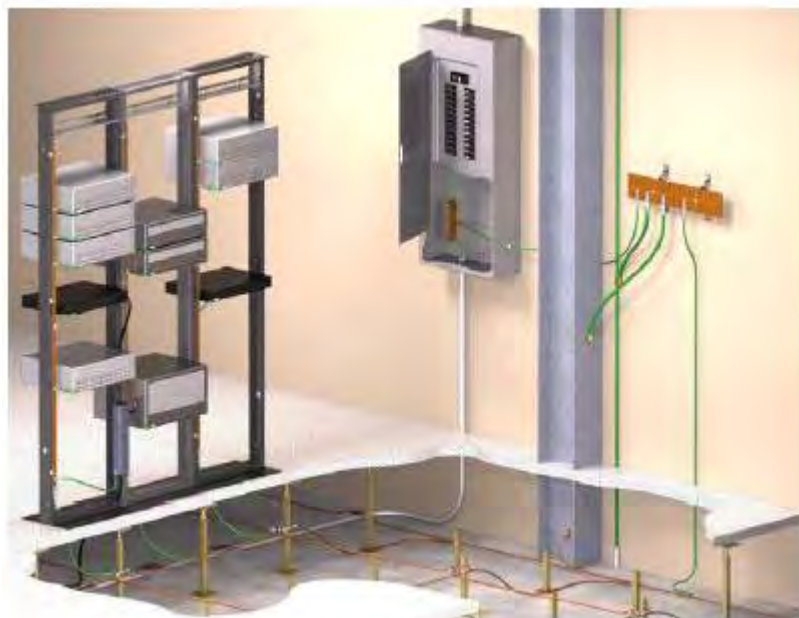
Data Center Grounding Infrastructure (Room Level) Example
